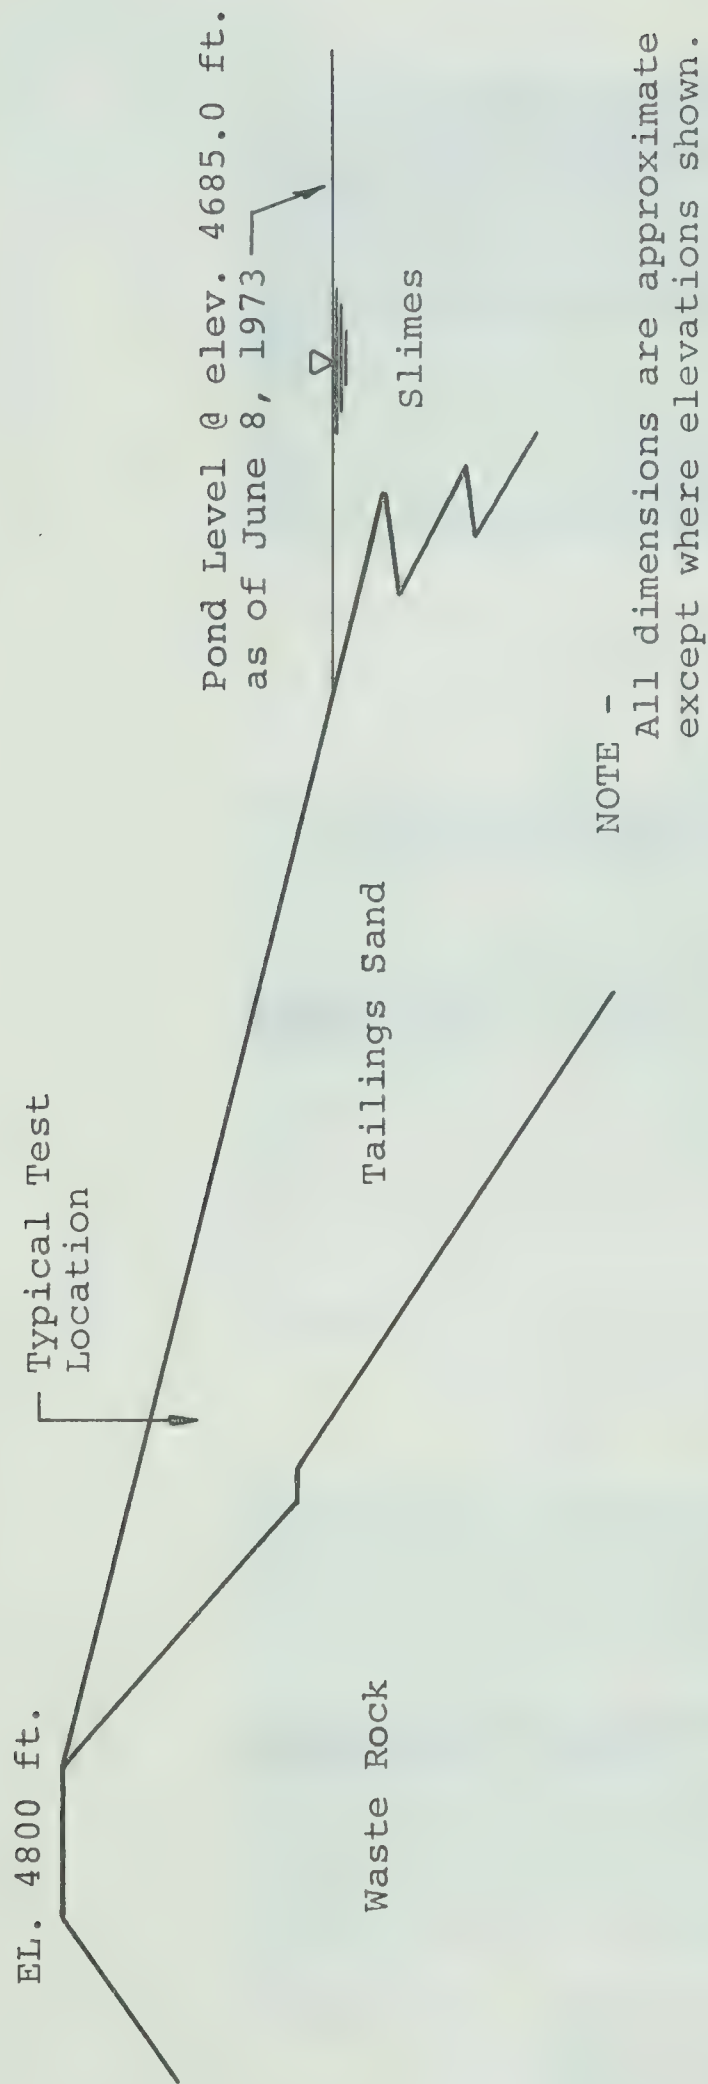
Typical Section of Bethlehem Tailings Dam at Test Locations Situated at Approximately 1000 feet From Each End of the Dam.
